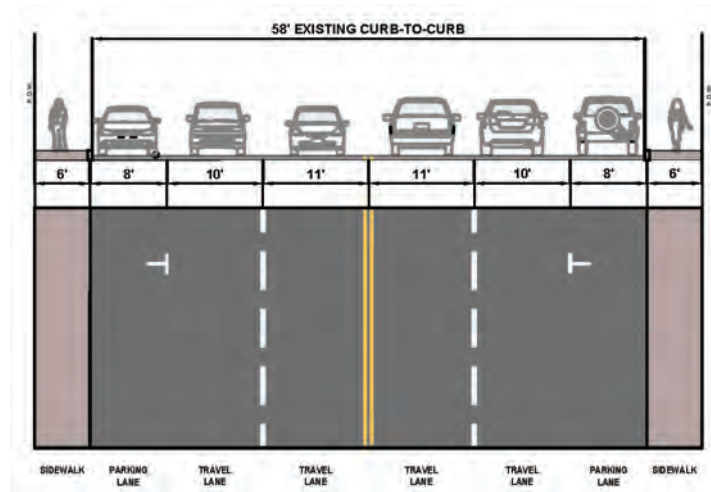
Bay Road Existing Typical Section From Woodside Road To Second Avenue
